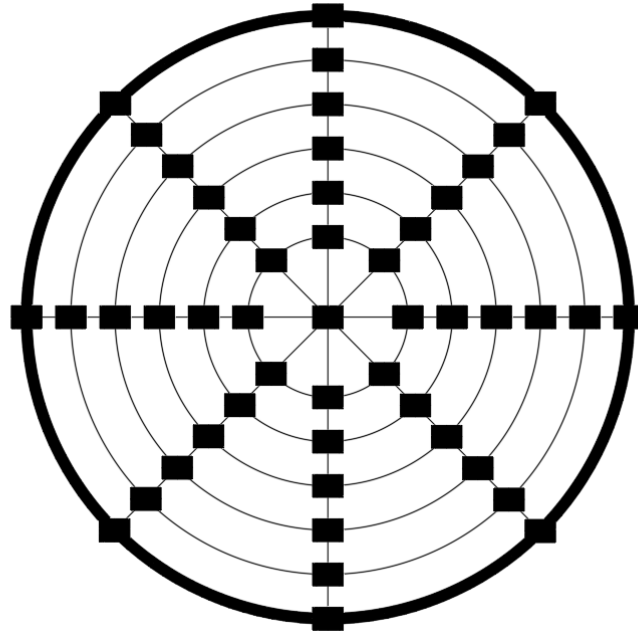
Arrangement of Type-A frame in a Dome Temporary Works
